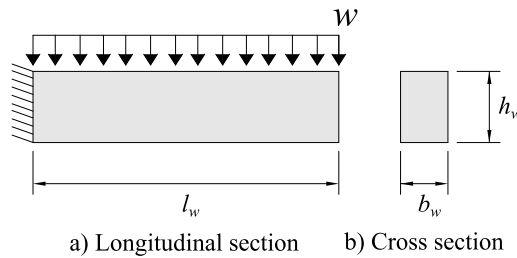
Cantilever beam: a) Longitudinal section, b) Cross section
